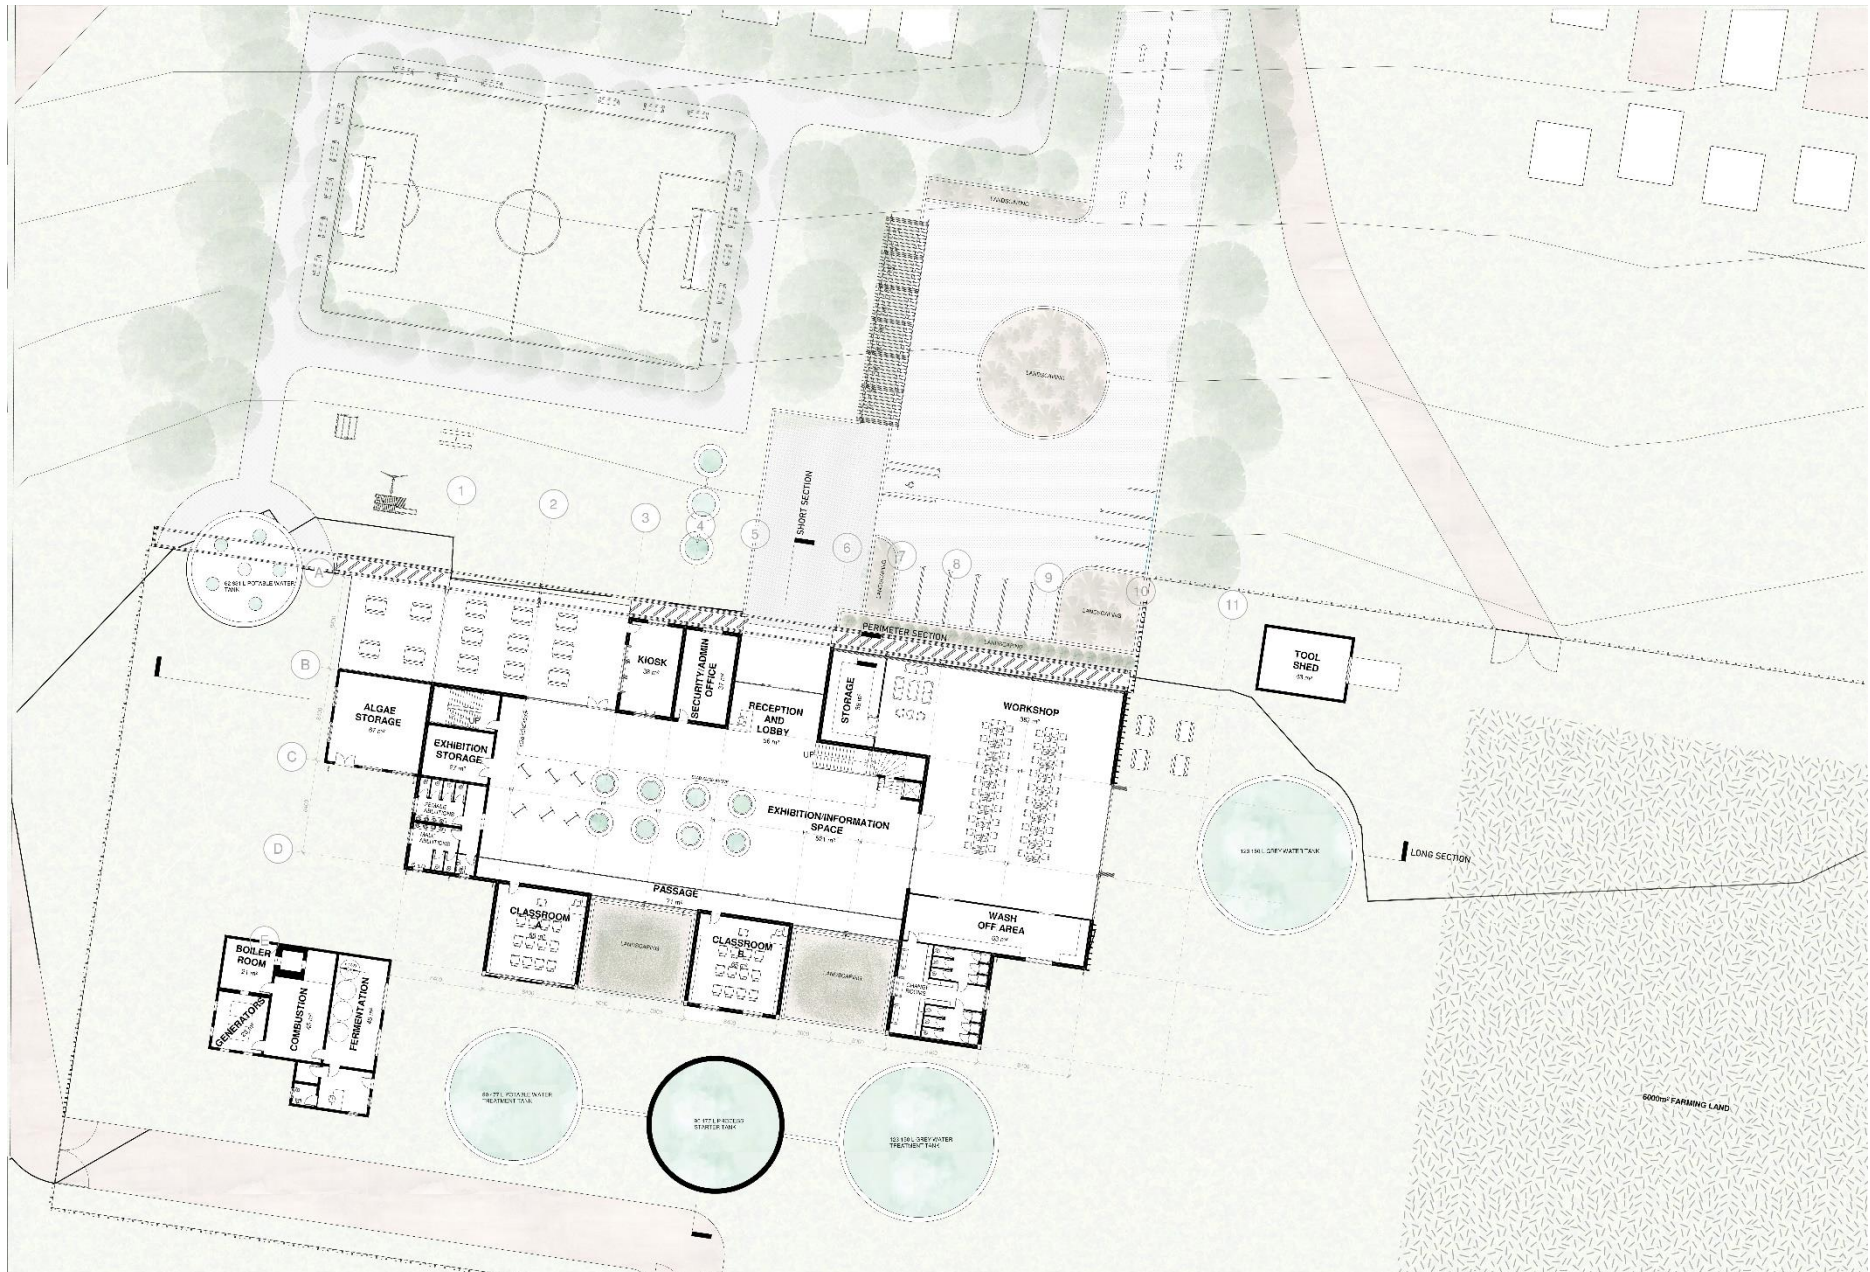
Ground Floor Plan by Author at 1:1600.
